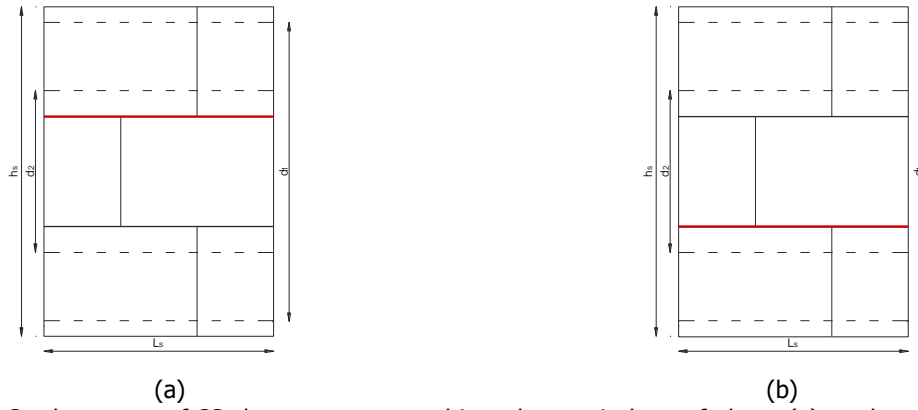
Crack patterns of CS element masonry subjected to vertical out-of-plane: (a) crack on the top joint; (b) crack on the bottom joint.
